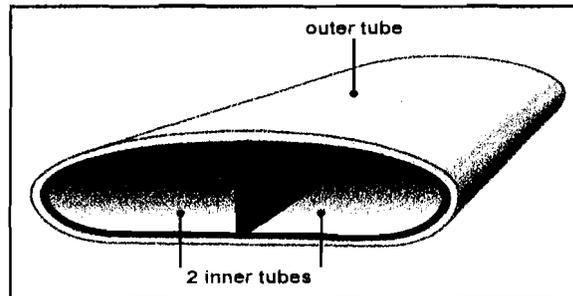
Flexible water-filled tube made of two inner and one outer tube improving position stability
